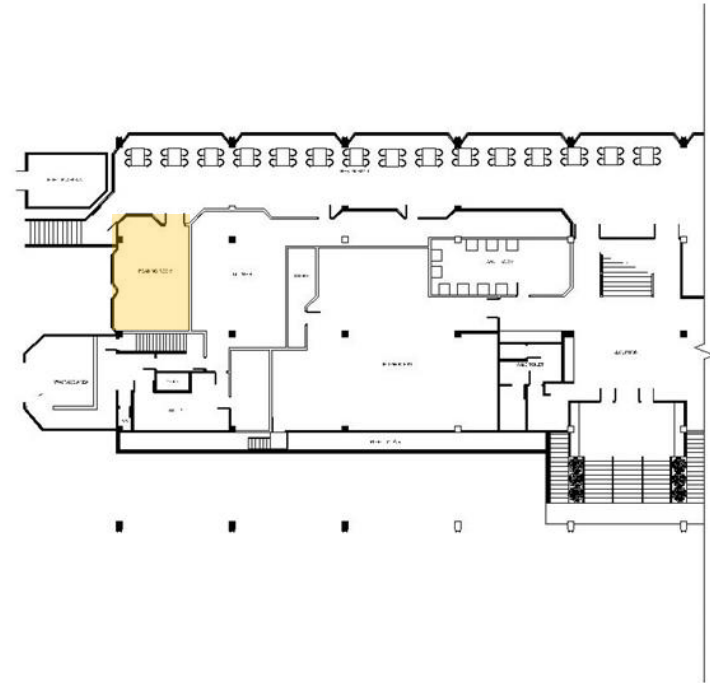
(v): Layout of highlighted ground floor plan (Lim,2017)
